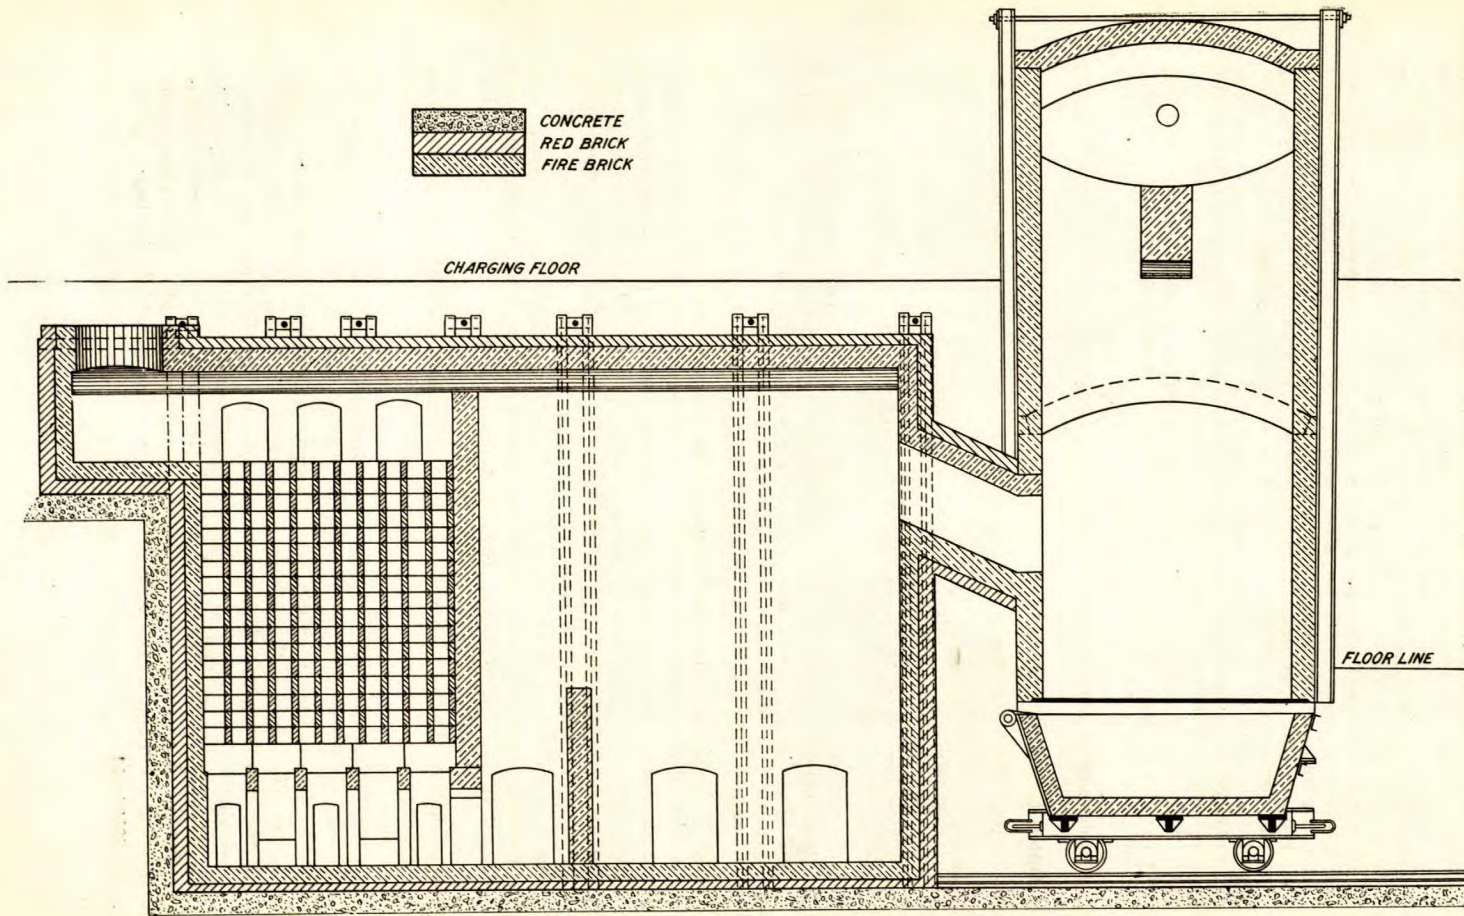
Section showing slag chamber, dust chamber and regenerator of Perkins-Fitch furnace (patented), Fuller Engineering Company.
